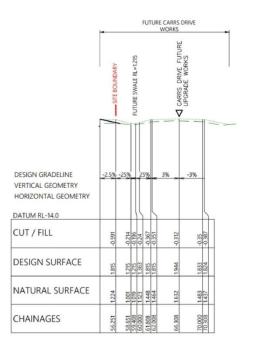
Extract from ROAD LONGITUDINAL SECTIONS - SHEET 1¹³
